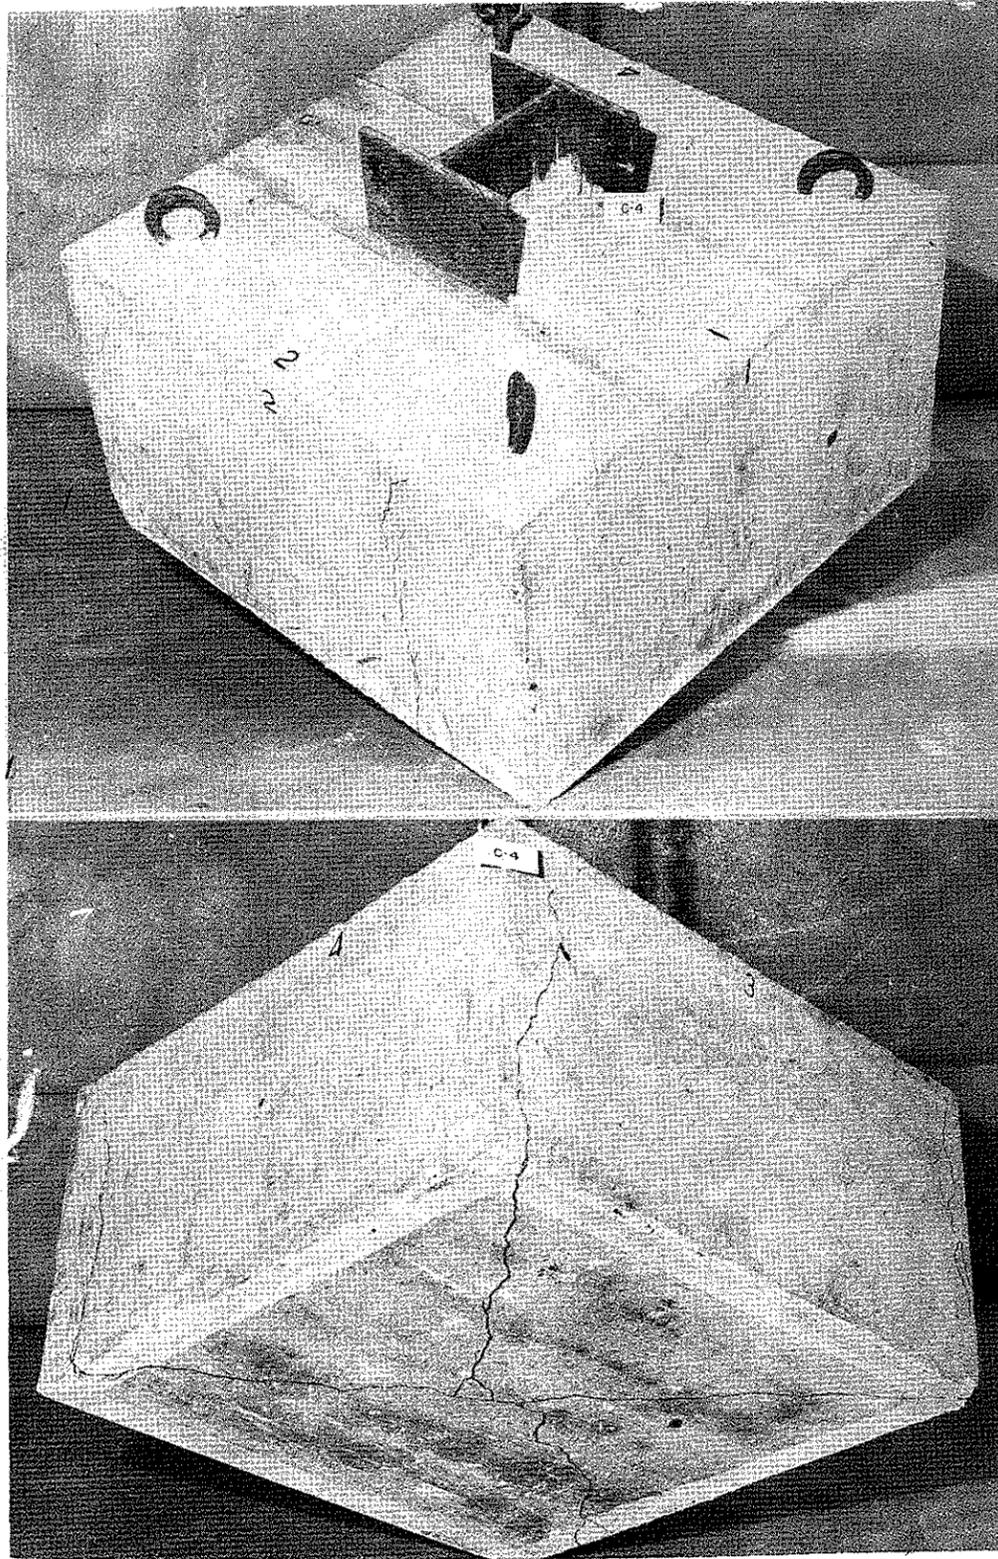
APPEARANCE OF SPECIMEN C-4 AFTER TESTING
